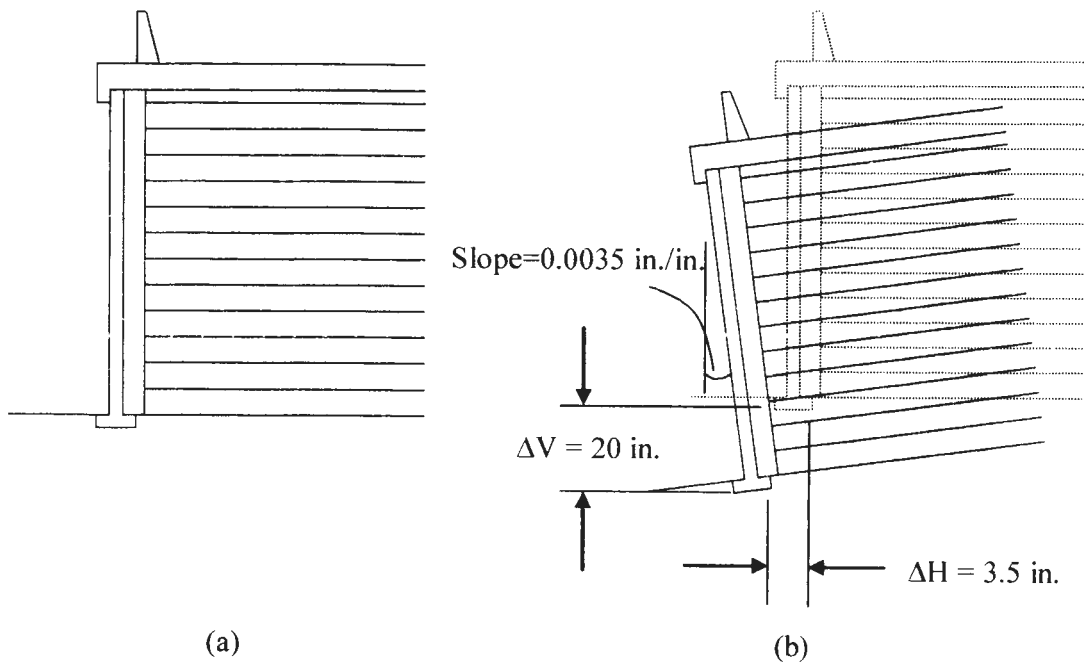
Comparison of the undeformed wall (a) to an exaggeration of the deformed wall (b)
